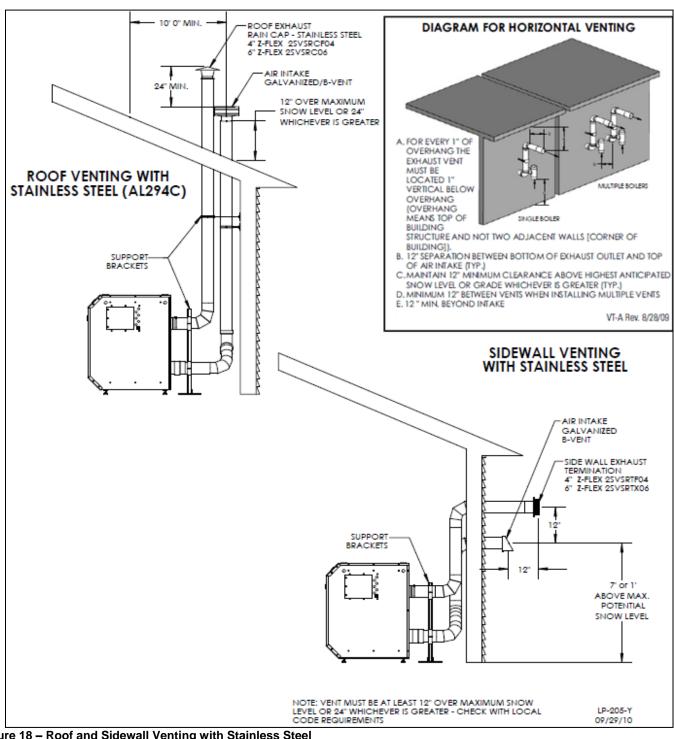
Roof and Sidewall Venting with Stainless Steel
